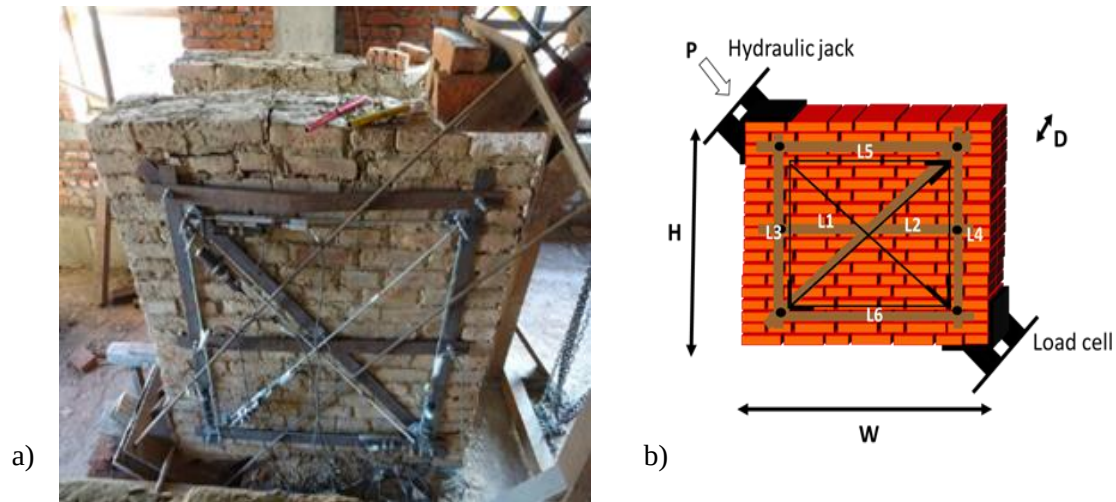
a) Diagonal compression test of steel reinforced specimen (SRM) specimen
